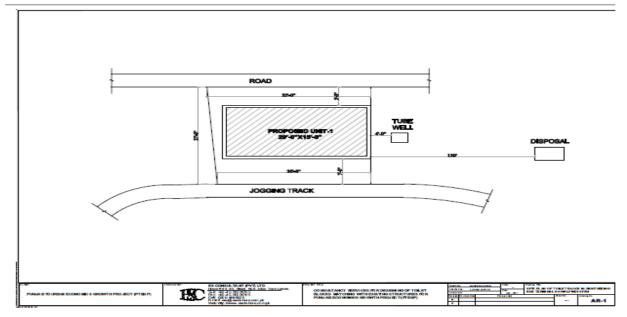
Layout Plan of Proposed toilet block at TDCP Sightseeing Terminal Site 2
